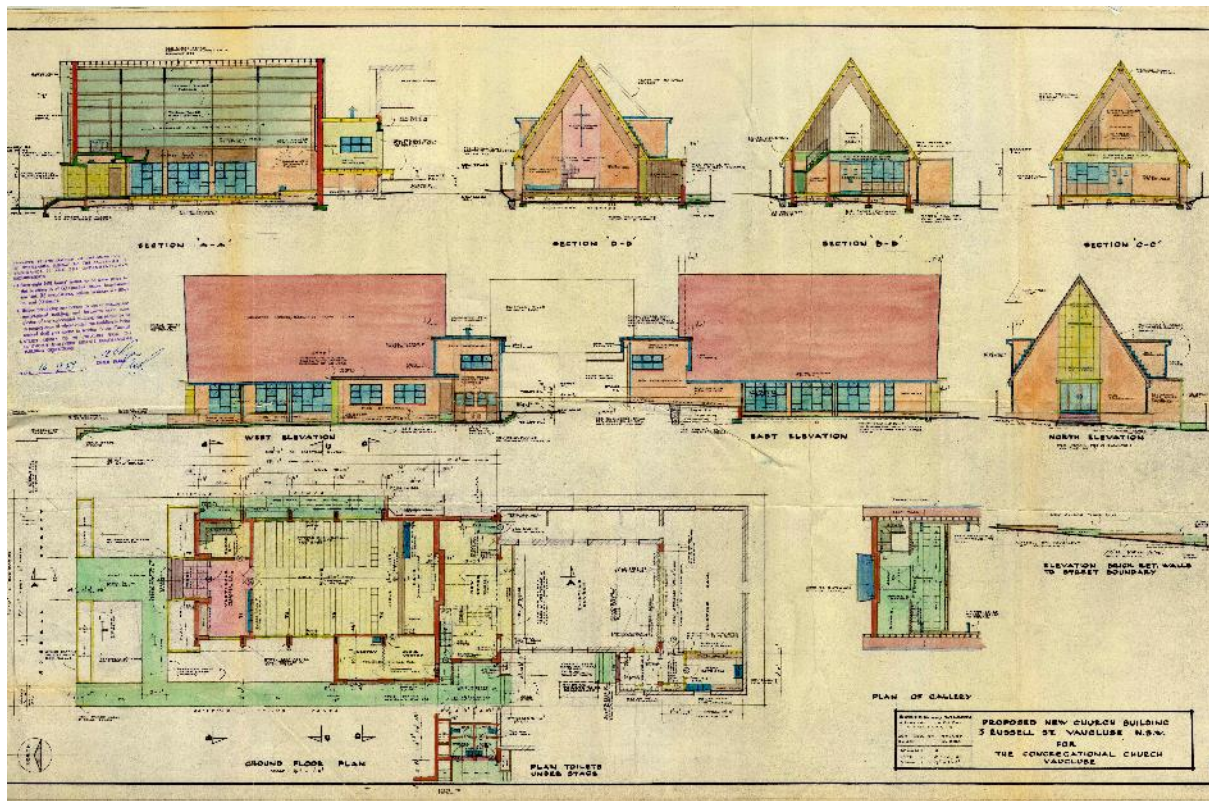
Original plans by Booker & Wilson for the 1960 A-frame church building (Source: Woollahra Council records)
